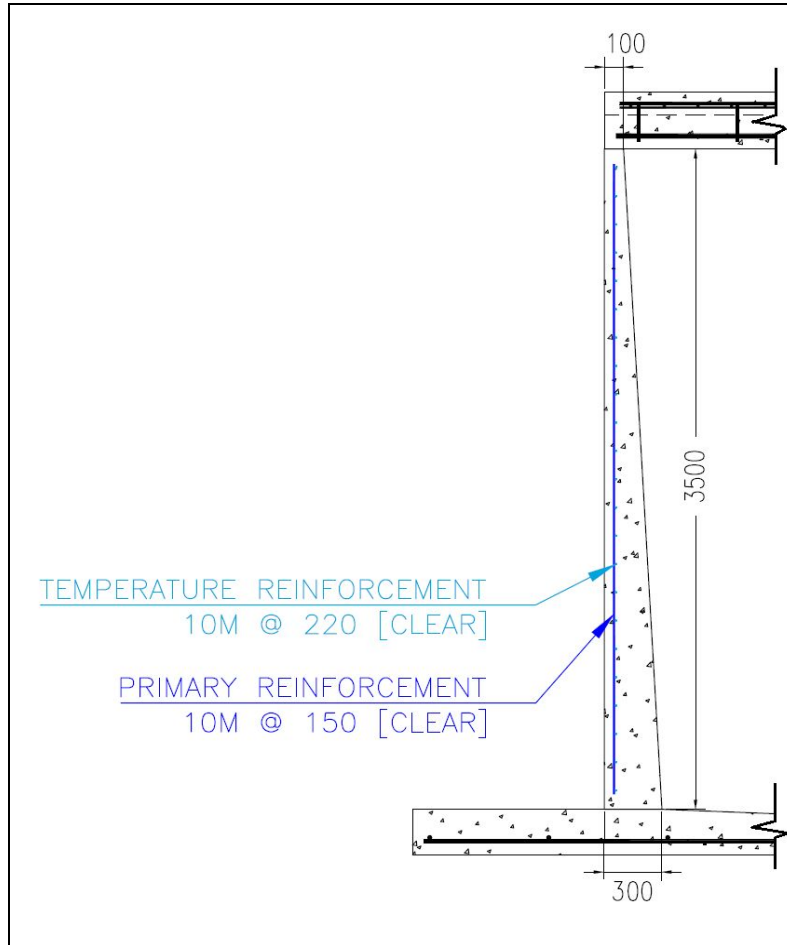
Underpass Detail - Wall Cross-Section (North-South)
